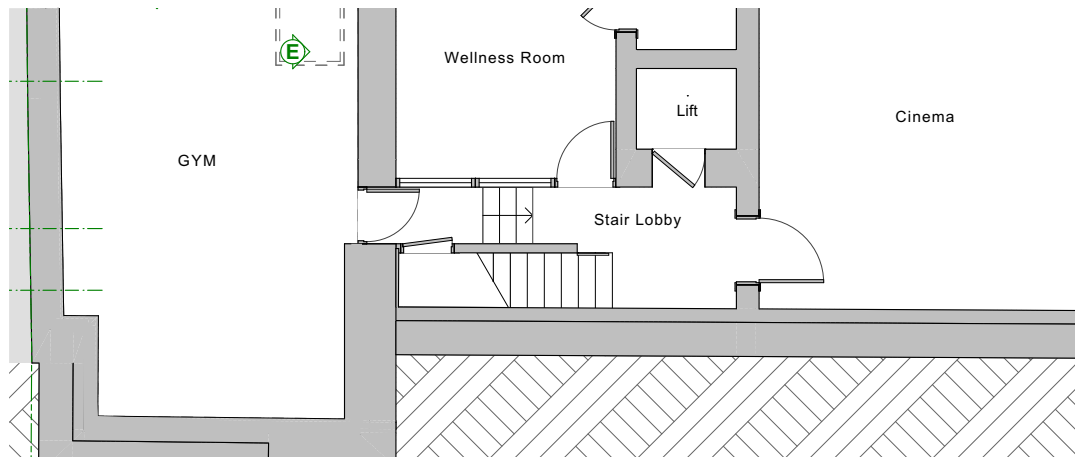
Partial Floor Plan of Approved Scheme (23/03312/FULL)
